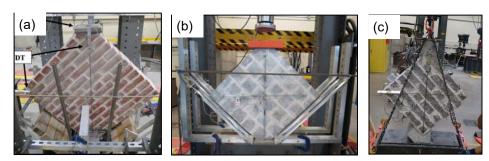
Masonry panels for diagonal tension tests: (a) Two-leaf bricks, (b) Single-leaf stone cubes, and (c) Multi-leaf stone blocks.
